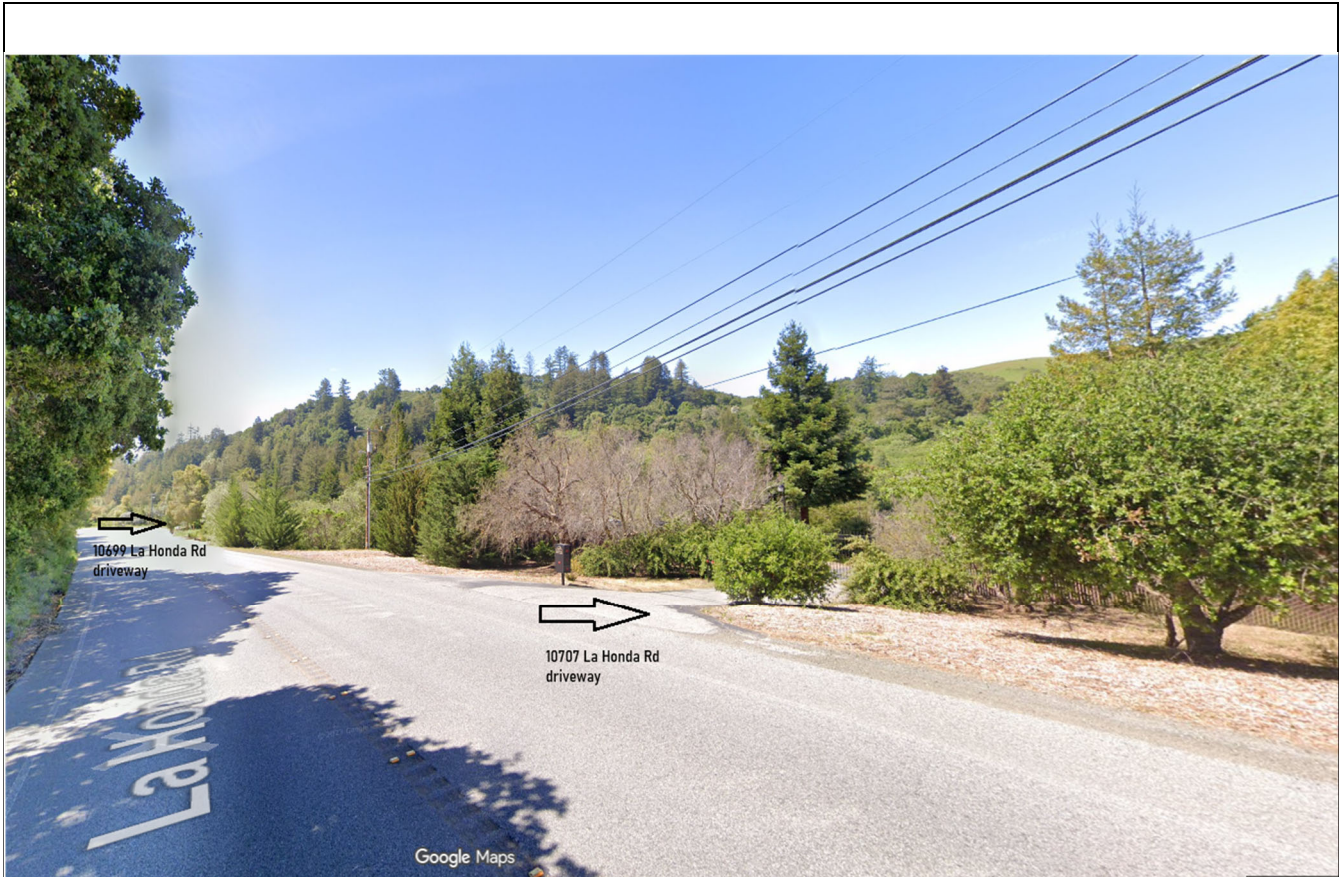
View of site driveways at 10699 and 10707 La Honda Road
